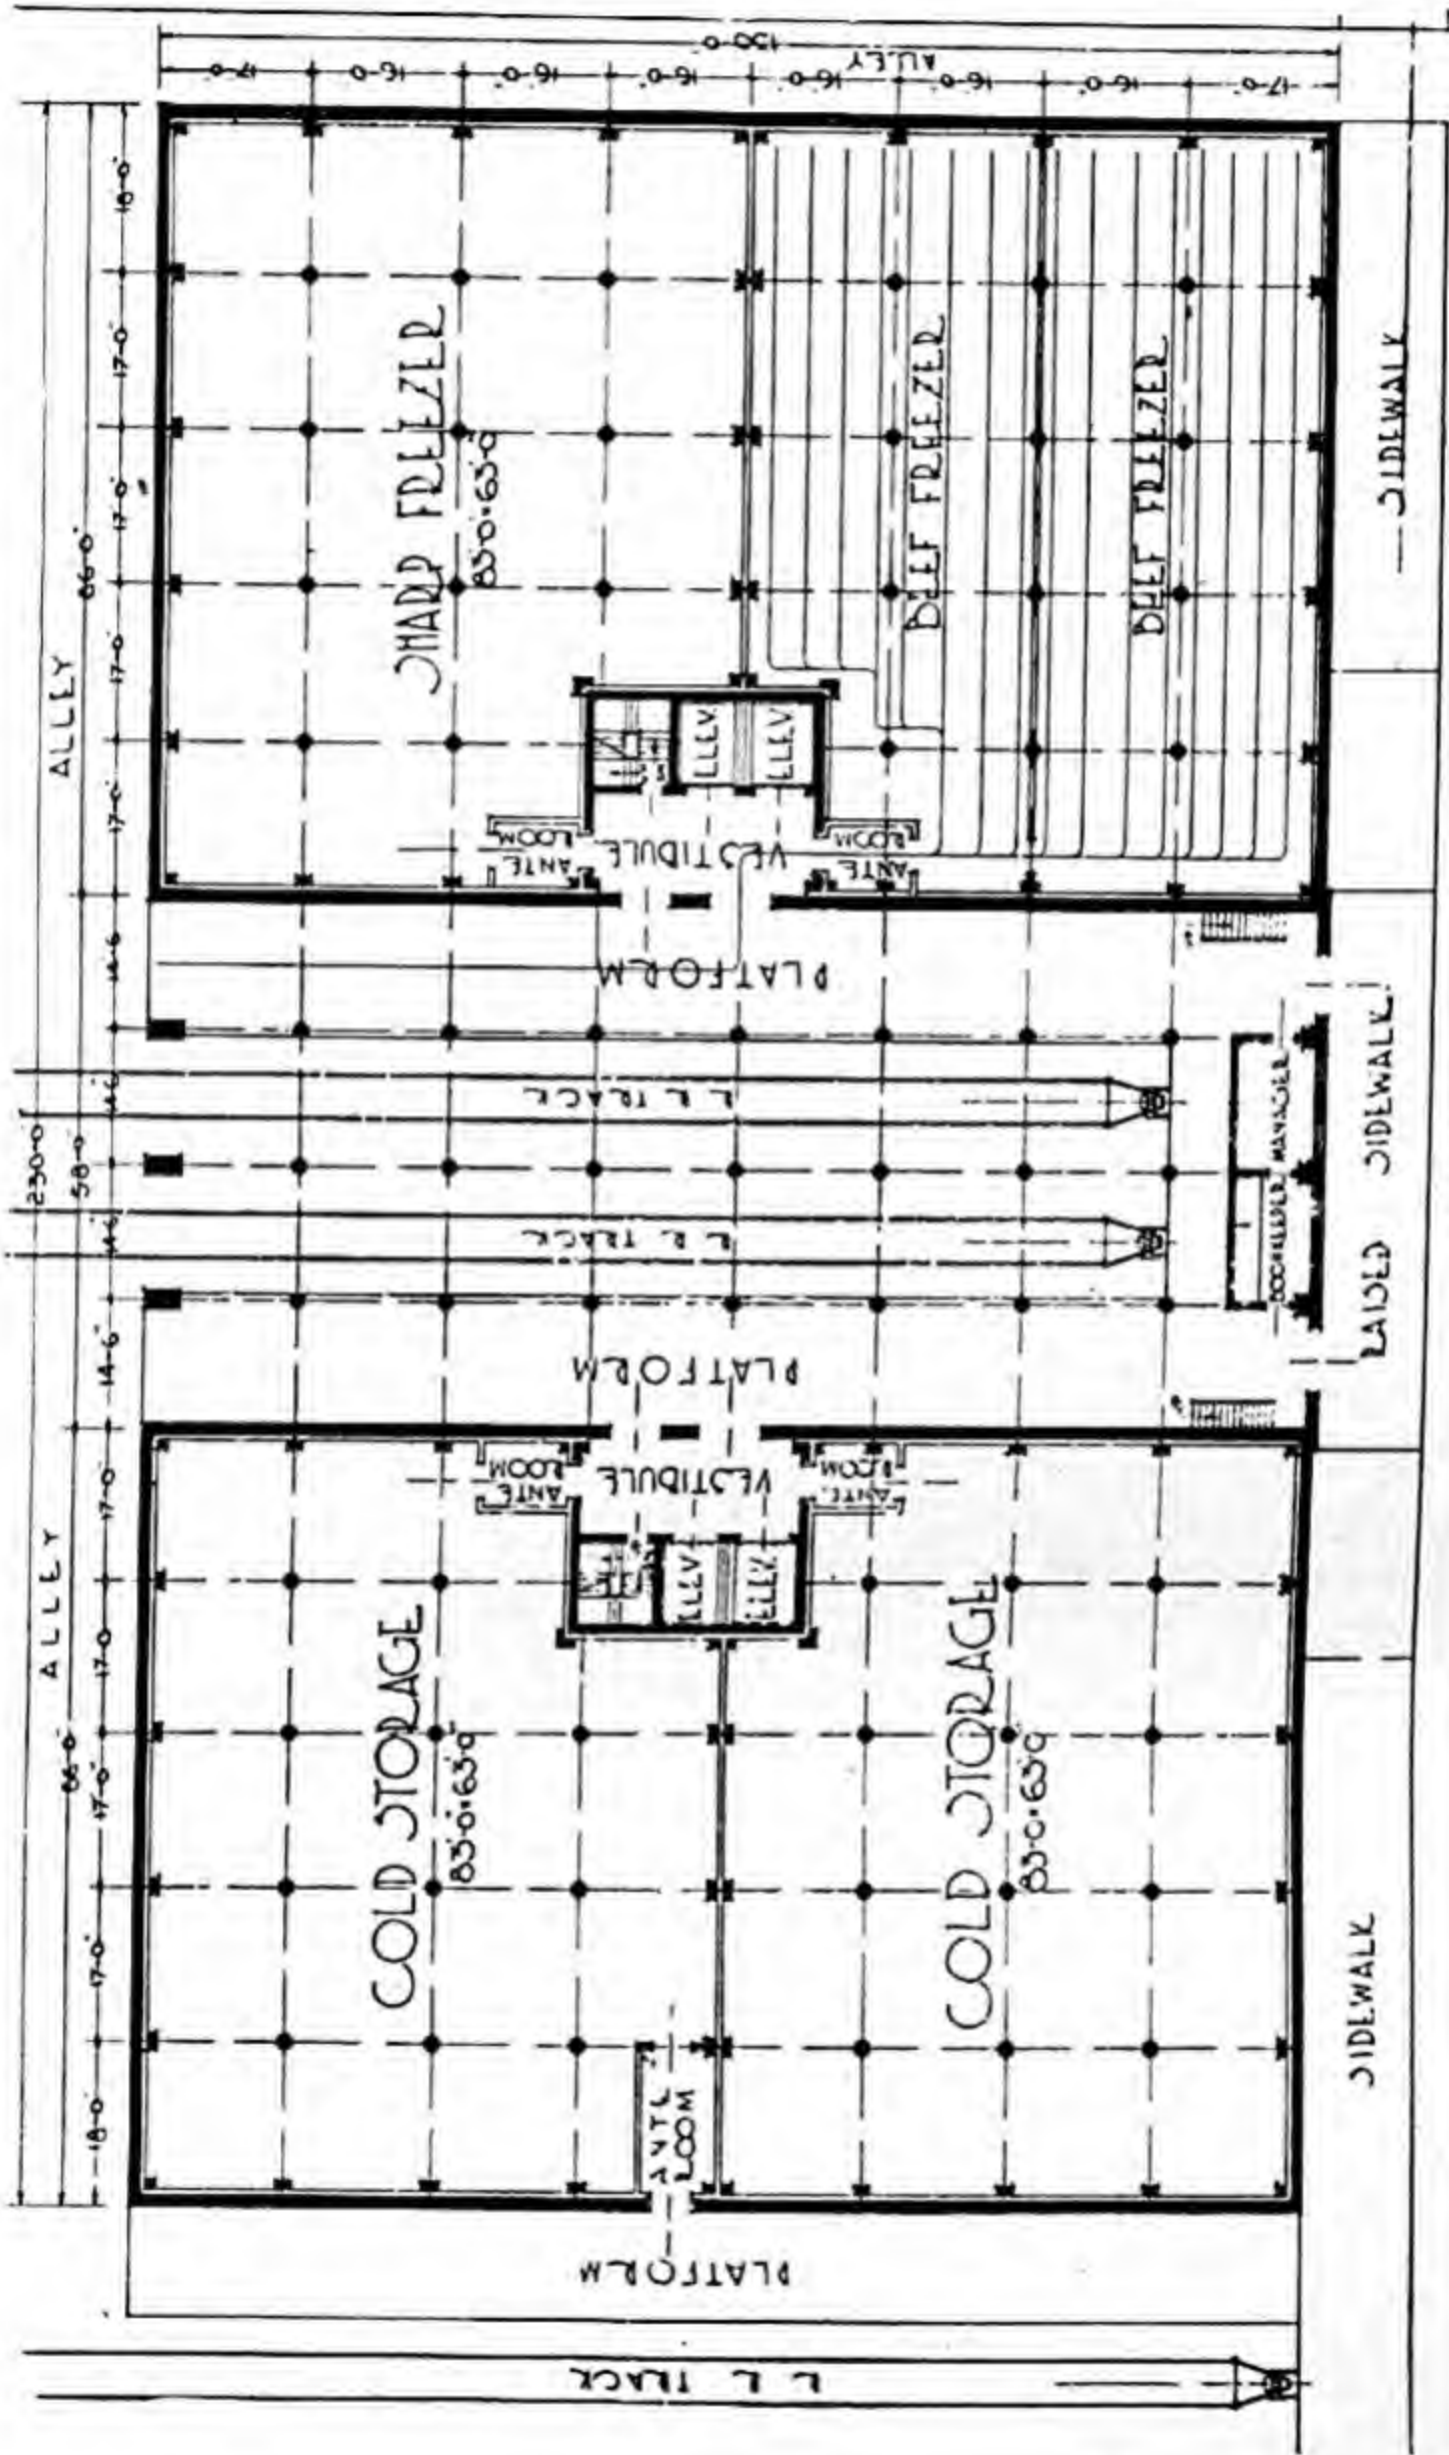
First Floor Plan of Merchants' Cold Storage & Warehouse Co. Plant, Chicago, Ill.
